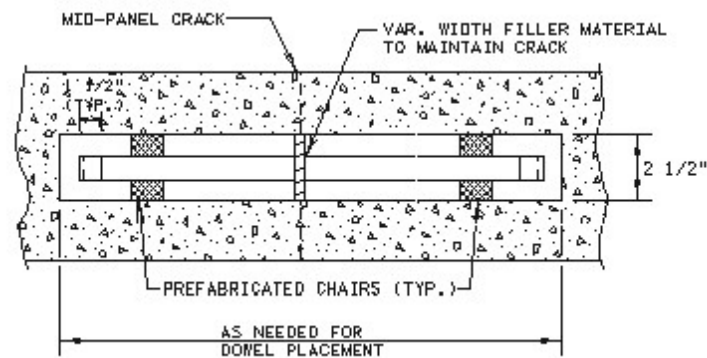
Typical Plan View of Retrofit Dowel Installation [3]
